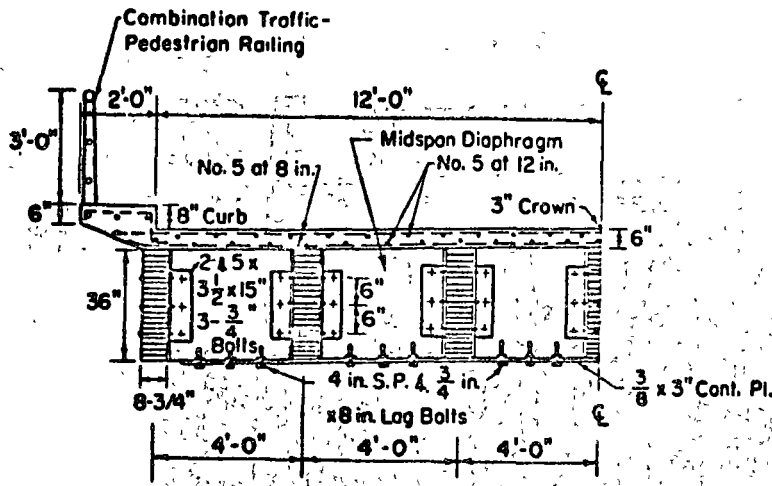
Transverse Semi-section of Composite Wood-Concrete Beam Bridge.
